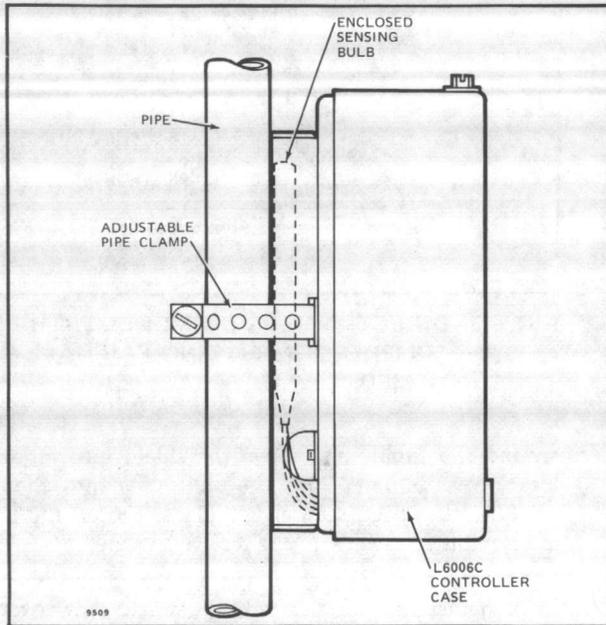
MOUNTING L6006C DIRECTLY ON SURFACE.
